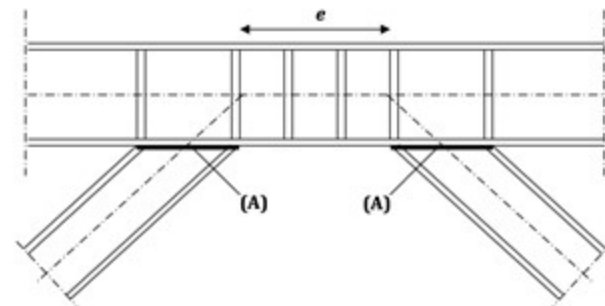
Welded brace connections of EBF: (A) full penetration groove welds in accordance with E.3.3.3(6)
